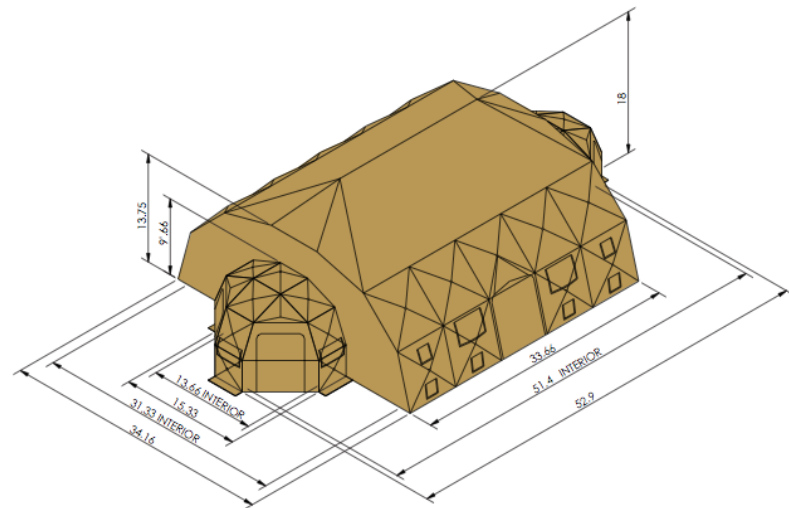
Geodesic: Deployable Rapid Assembly Shelter
